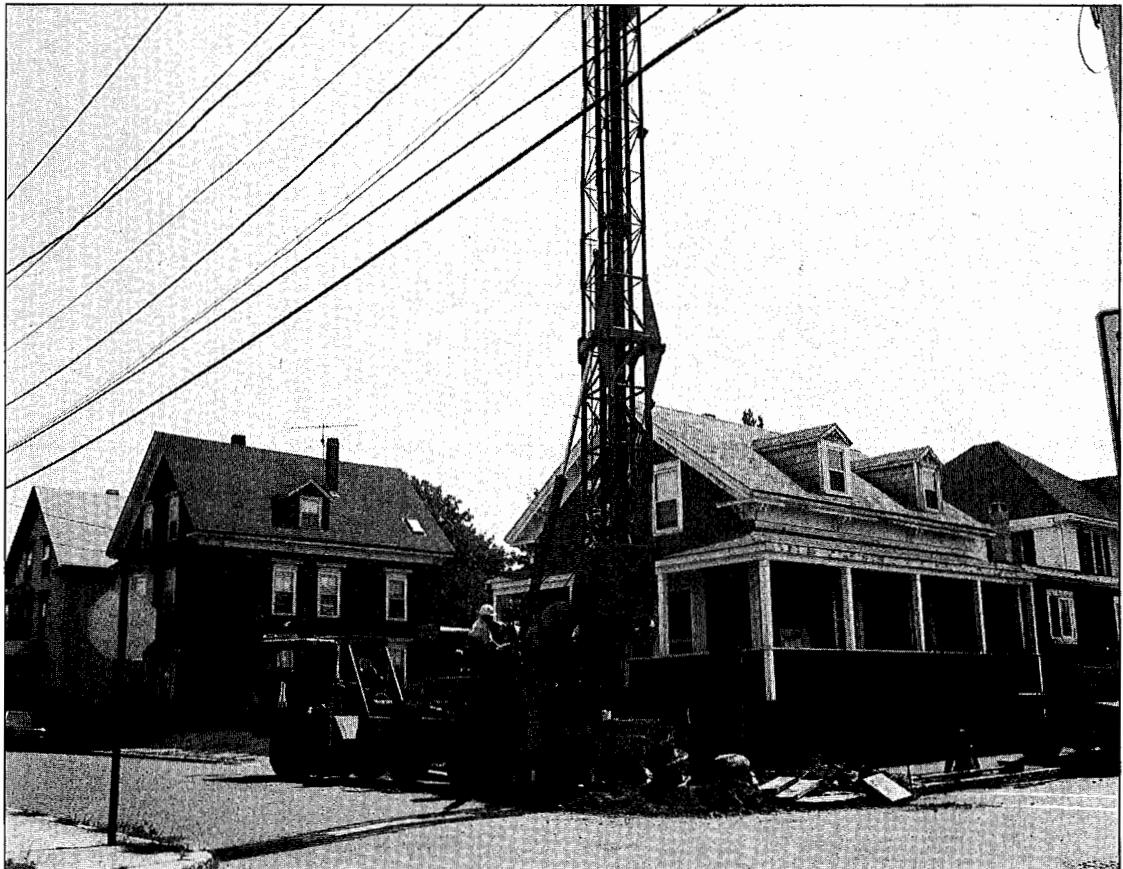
Looking southeast along the tunnel alignment from the playground at the Bass River Shaft.
